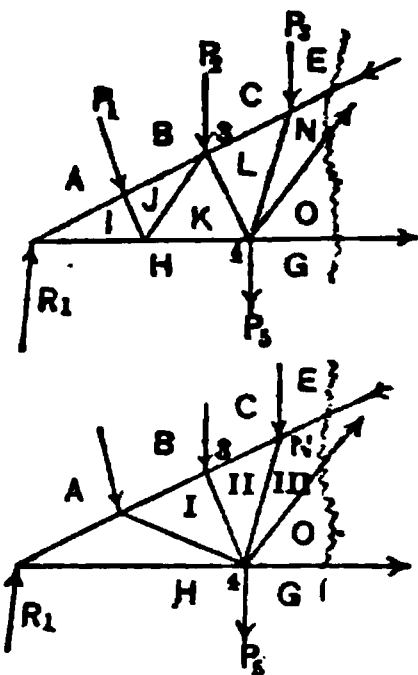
Unsymmetrical Truss. Truss-diagrams
